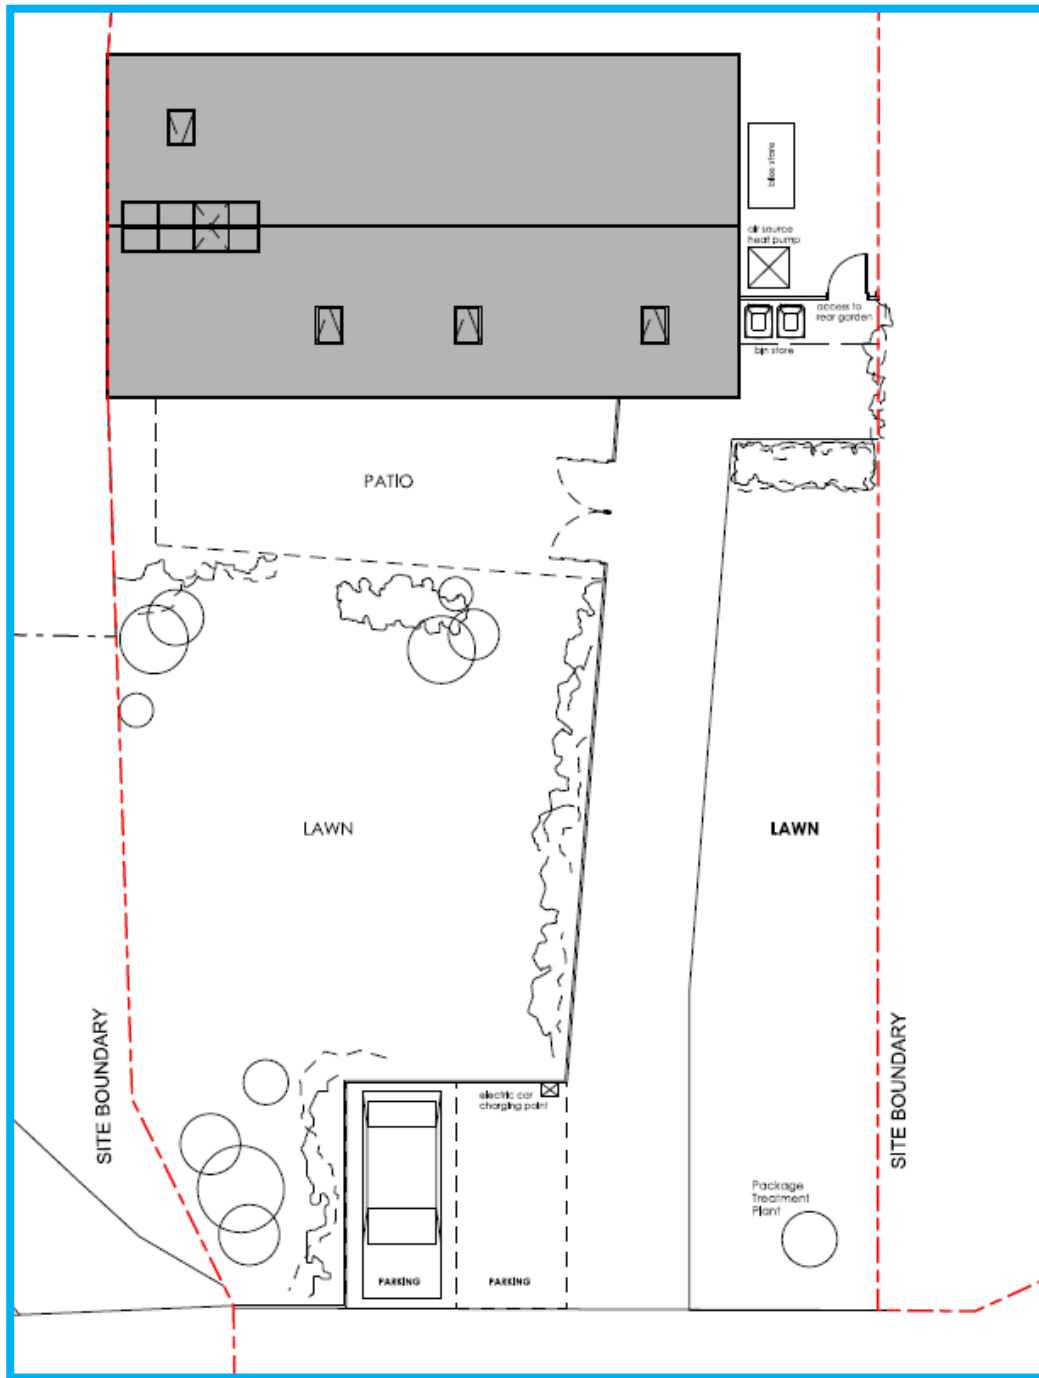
Site plan showing improved setting with permeable patio, parking and gardens (Mitchel Eley Gould).
